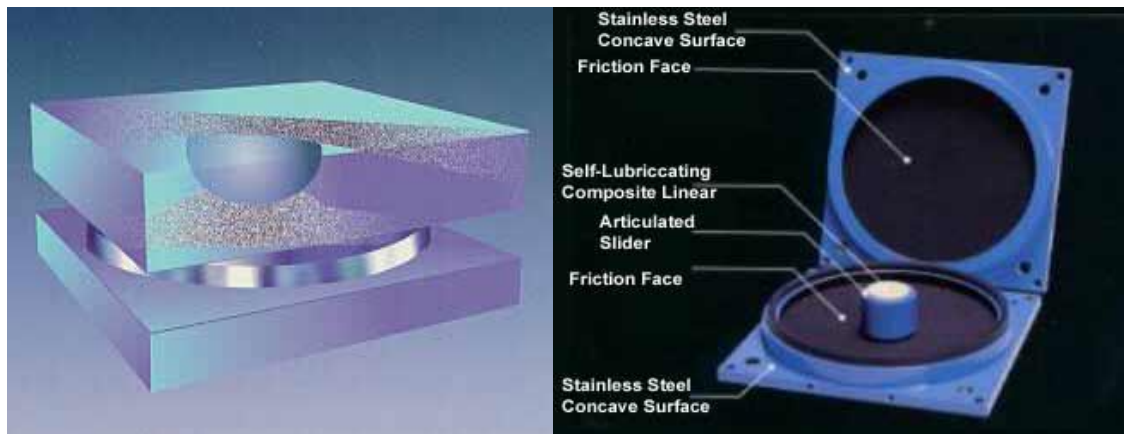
Cross section of a friction pendulum bearing Detail of a friction pendulum bearing
